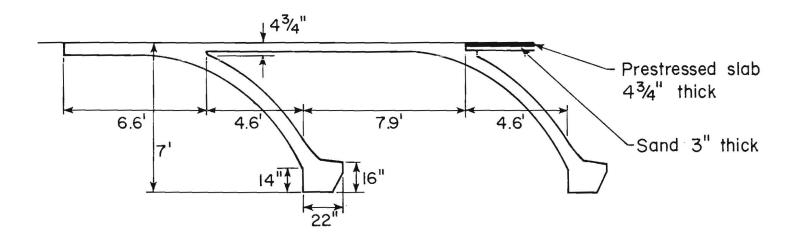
ABUTMENT FOR PRESTRESSED PAVEMENT AT BOURG-SERVAS, FRANCE
